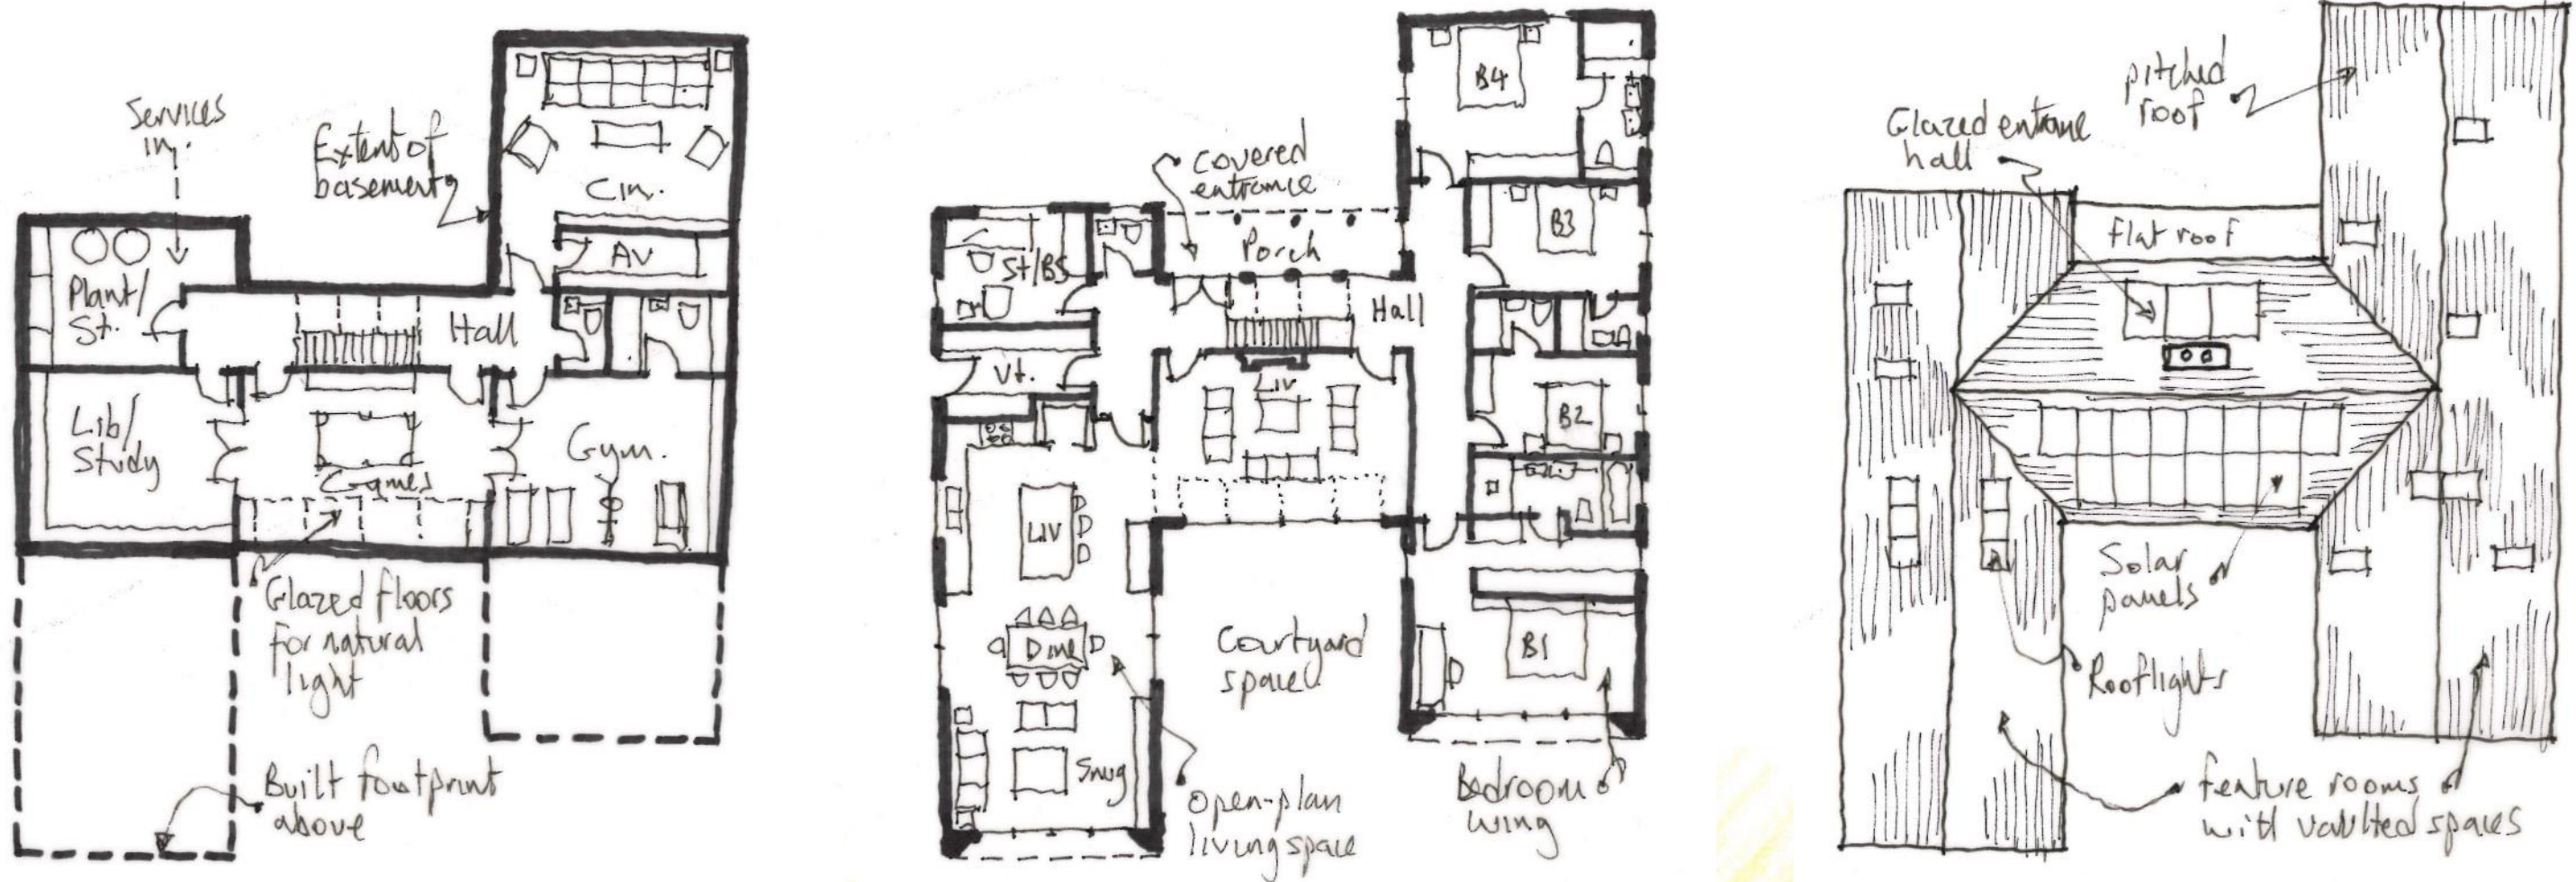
Sketch plans and elevations submitted for Pre-application advice.
